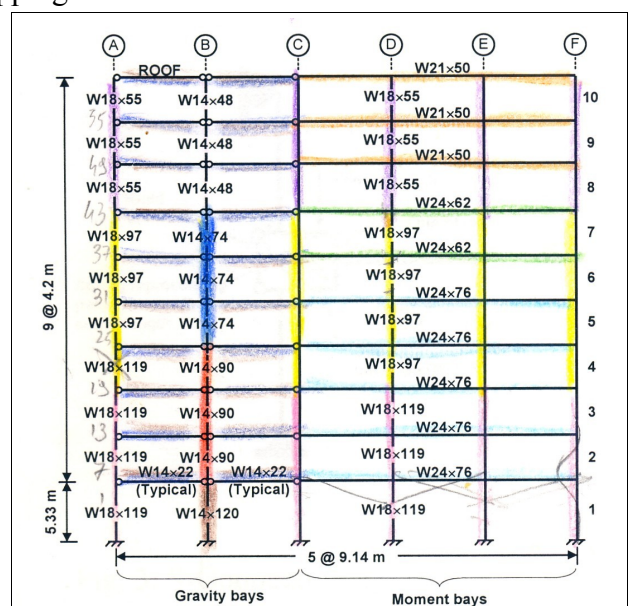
Elevation of the used model. Each color corresponds to a frame section type. (Source: [21]).
